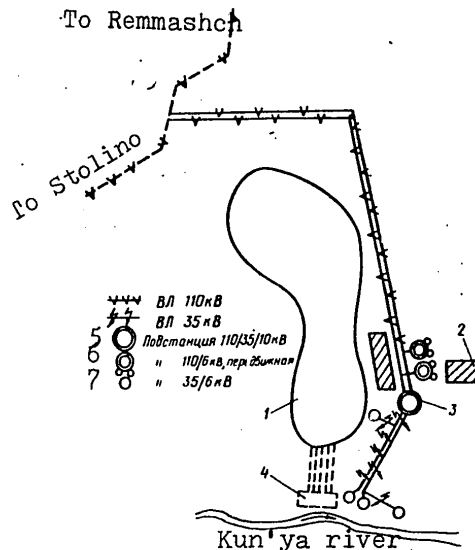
Layout of electric power supply to the Zagorskaya GAES construction site.
